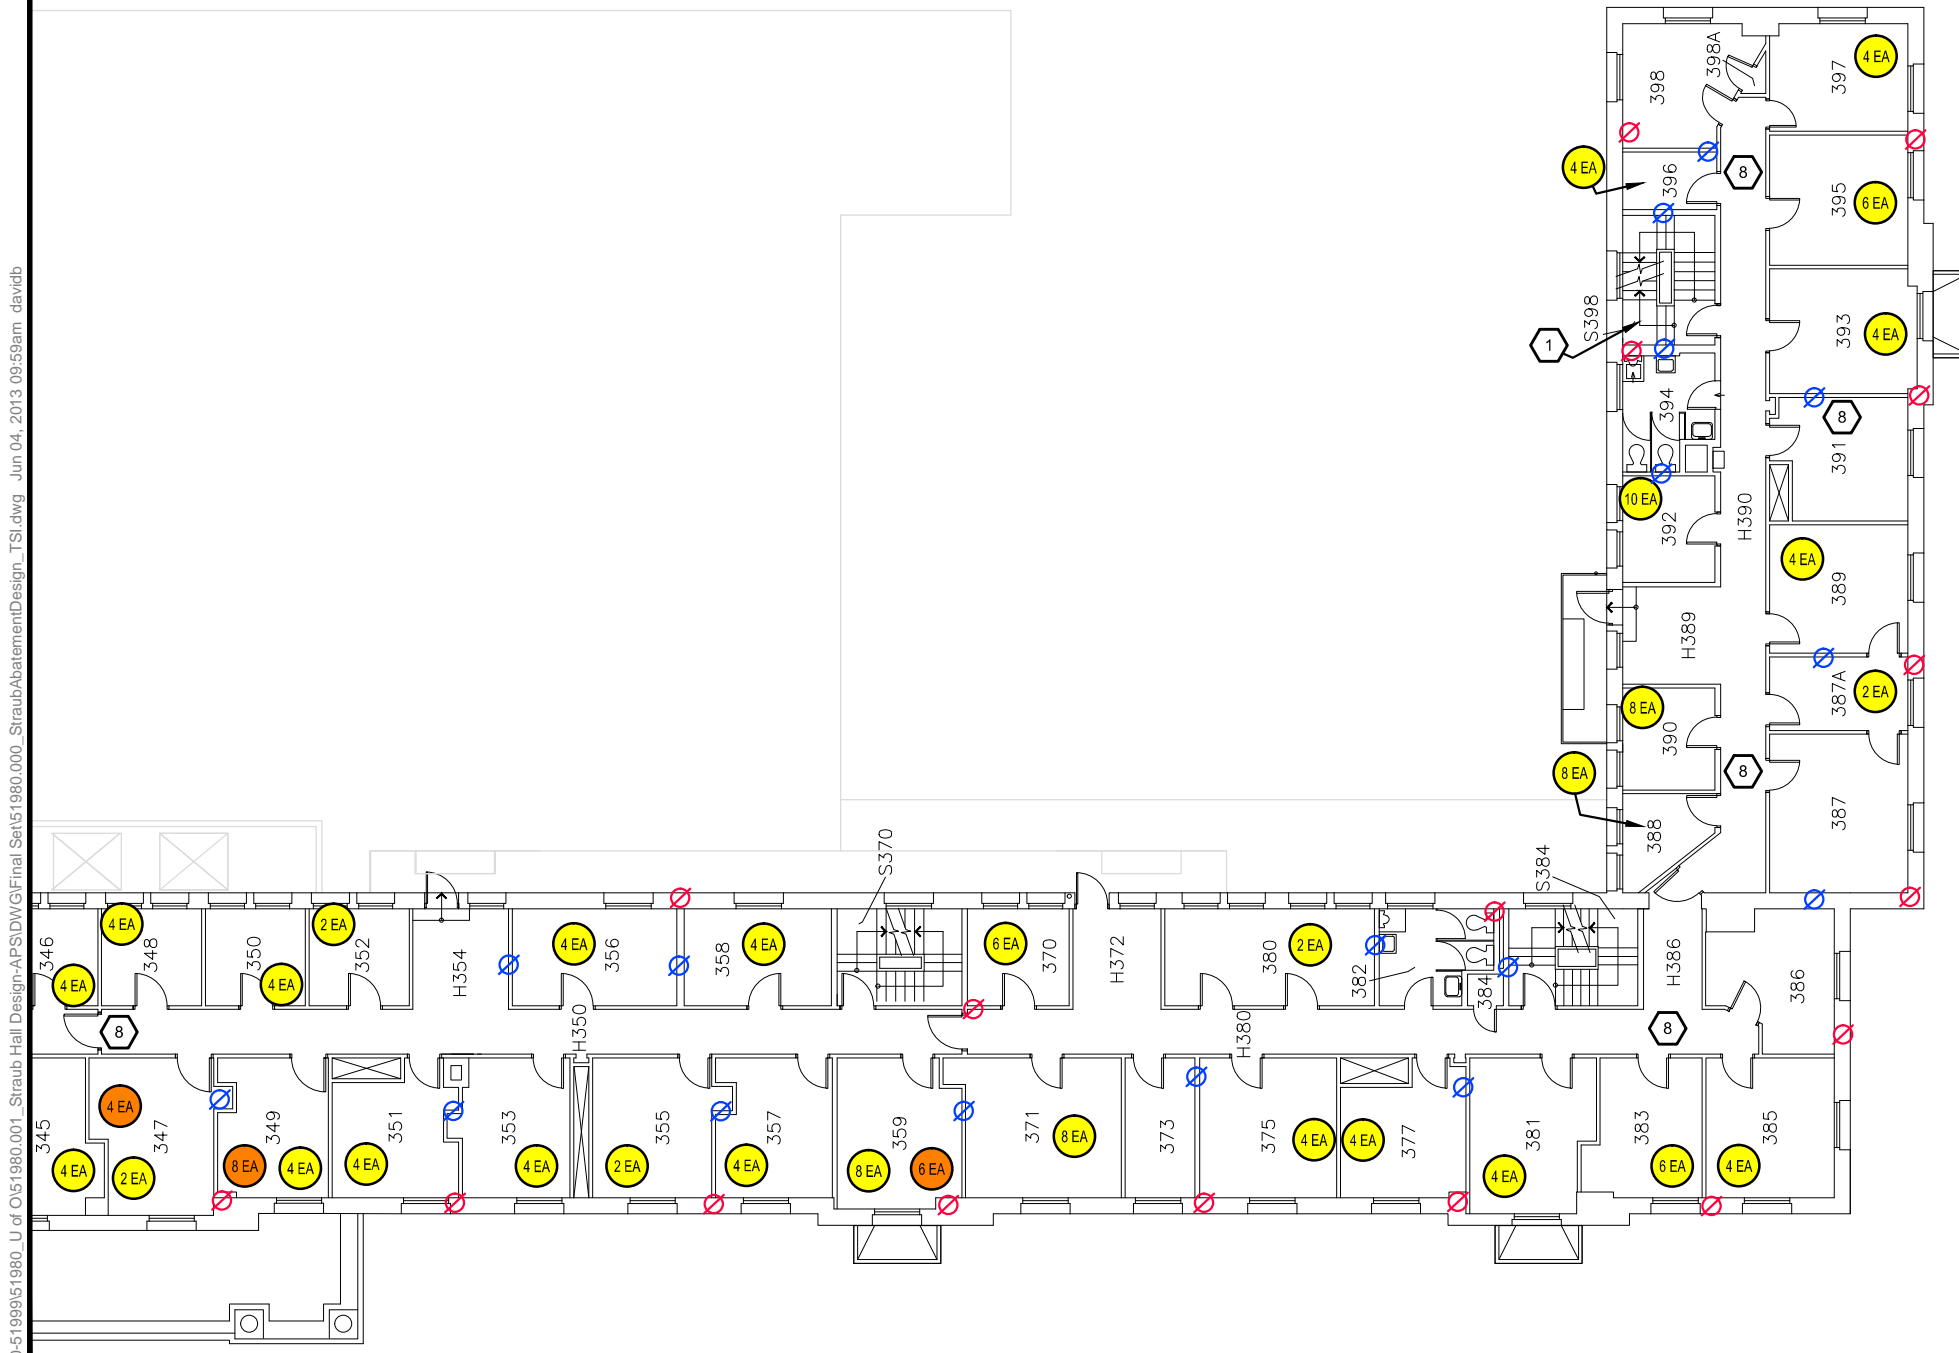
STRAUB HALL - THIRD FLOOR - SOUTH HALF
